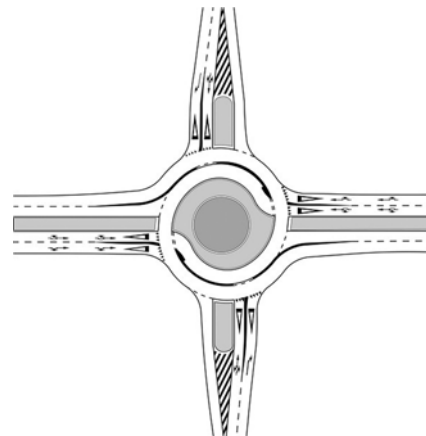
Typical layout of a turbo roundabout (Fortuijn 2009)
